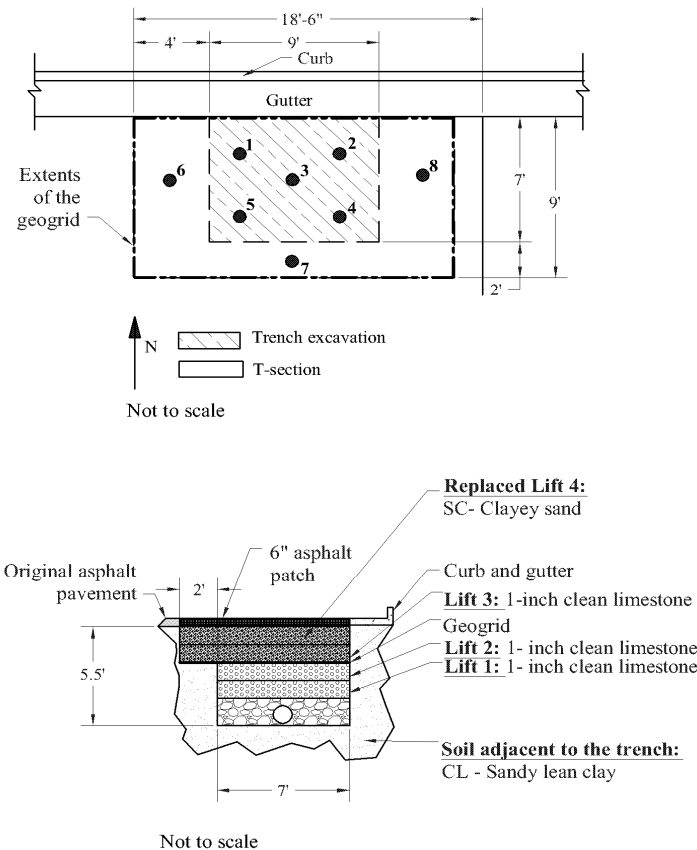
Location of test points in Trench F; cross-section of the trench
